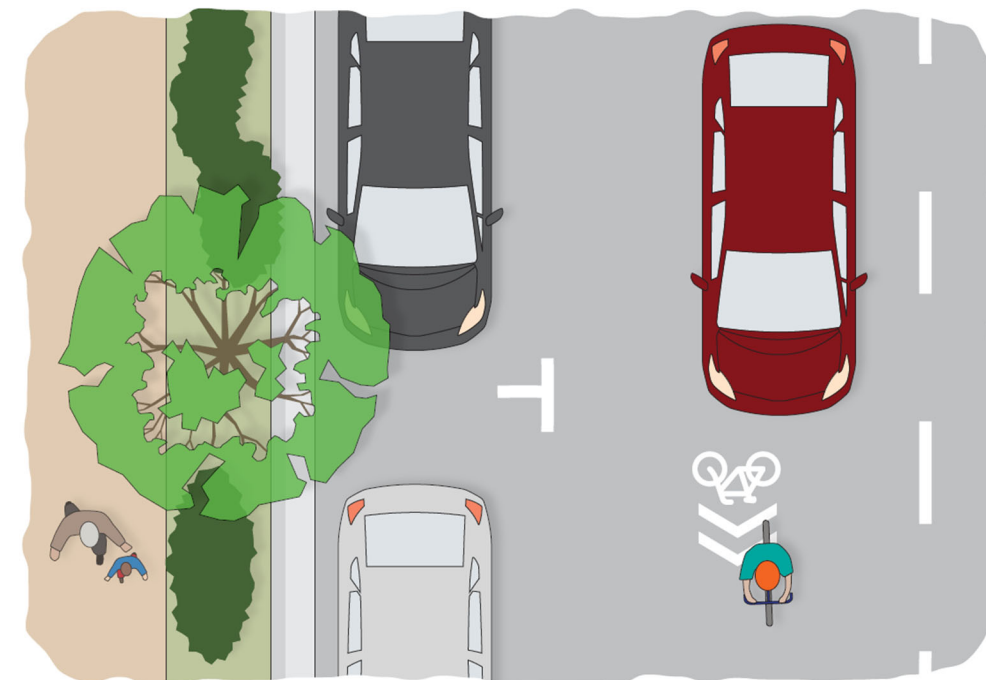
CLASS BIKE ROUTE PLAN VIEW
